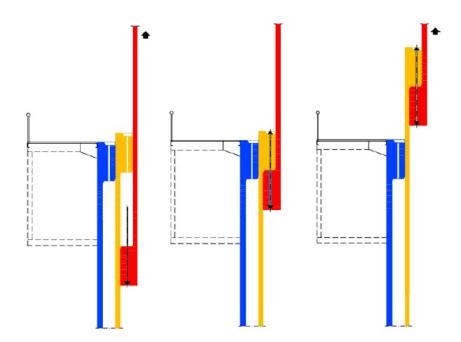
Erection procedure of the telescopic tower, (left) the first section is lifted, (middle) applying the prestressing bars into the joint and (right) lifting the interconnected sections, taken from Mendizabal (2014)
